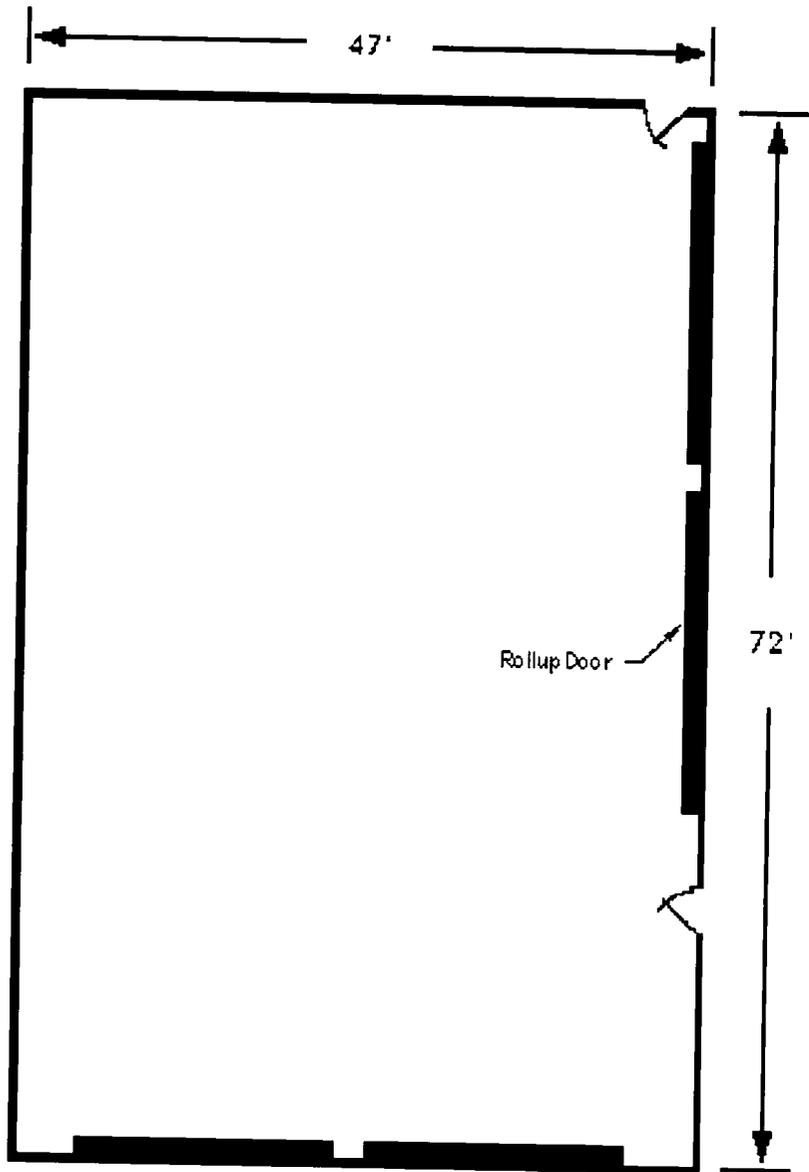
SWSA 6 Waste Storage Facility, Building 7842.
